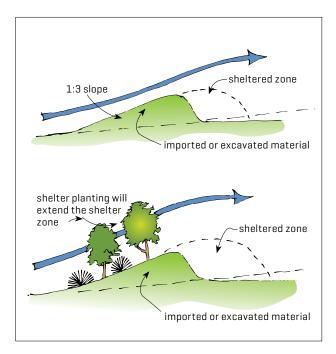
Earth mounding to provide shelter. The imported material can also improve the ground conditions to get the shelter planting established as well as acting as a wind management tool.
